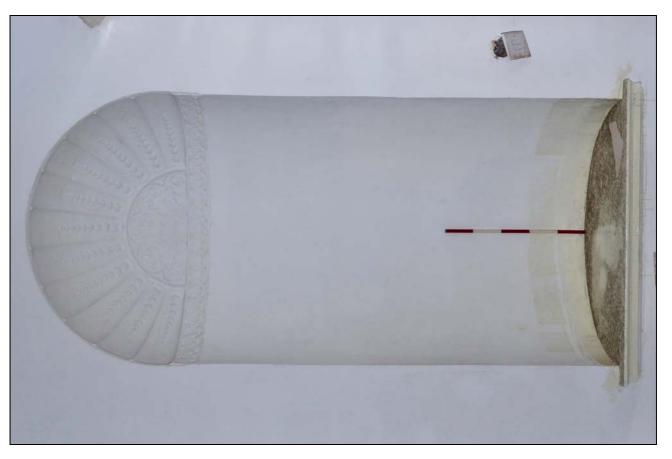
Ground floor: R4 (dining room), detail of enriched, arched niche
